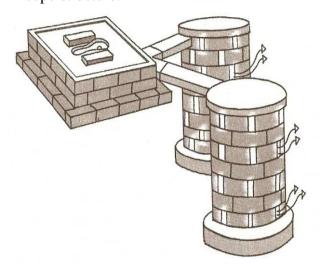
Single pit toilet with provision of a second pit Fig 4.3An open ring channel pit
